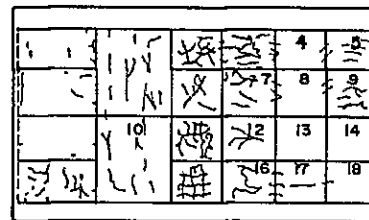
CRACKS DEVELOPED ON THE CONCRETE FLOOR SLABS OF THE MAIN AND APPROACH BRIDGE — KRUNG THON BRIDGE
